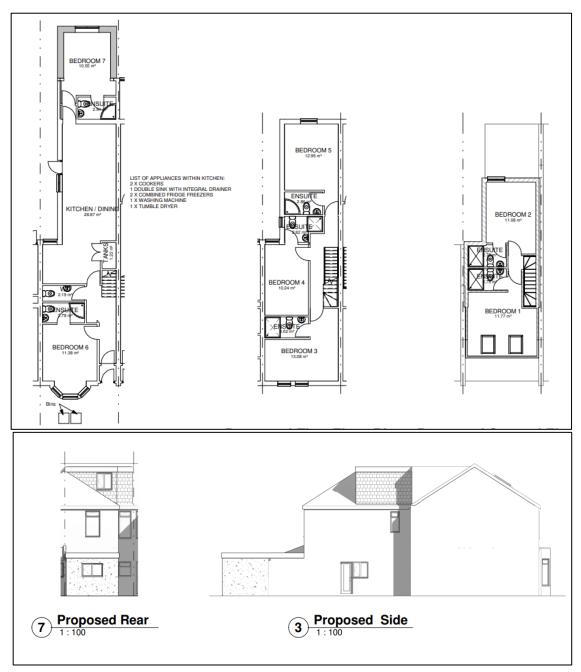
and 3 - Proposed Floor Plans and Proposed Elevations
